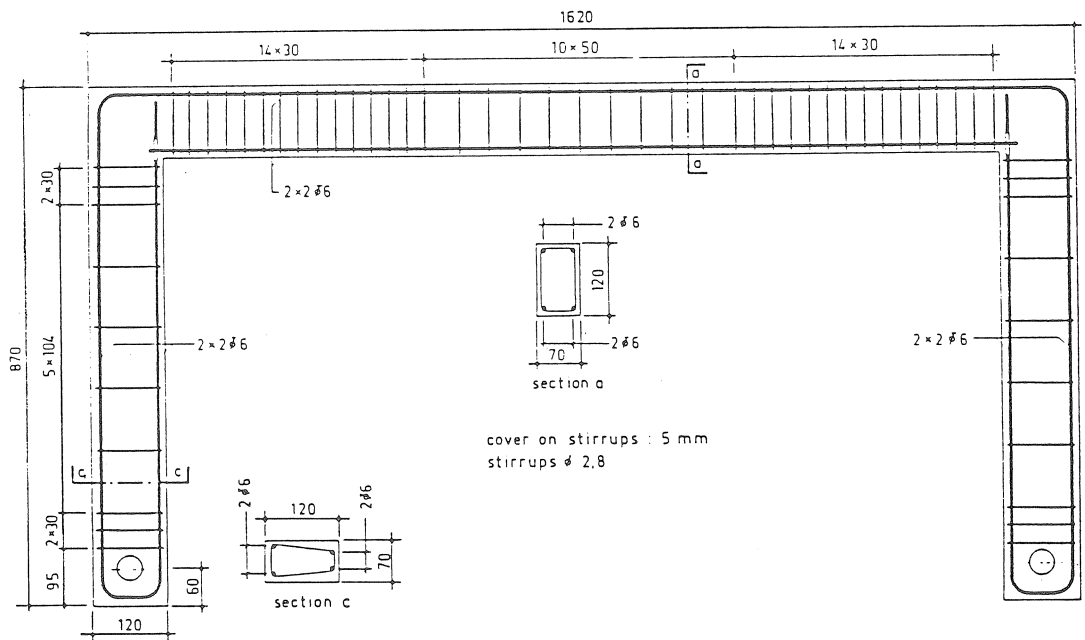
Portal frame: dimensions and reinforcement details.
